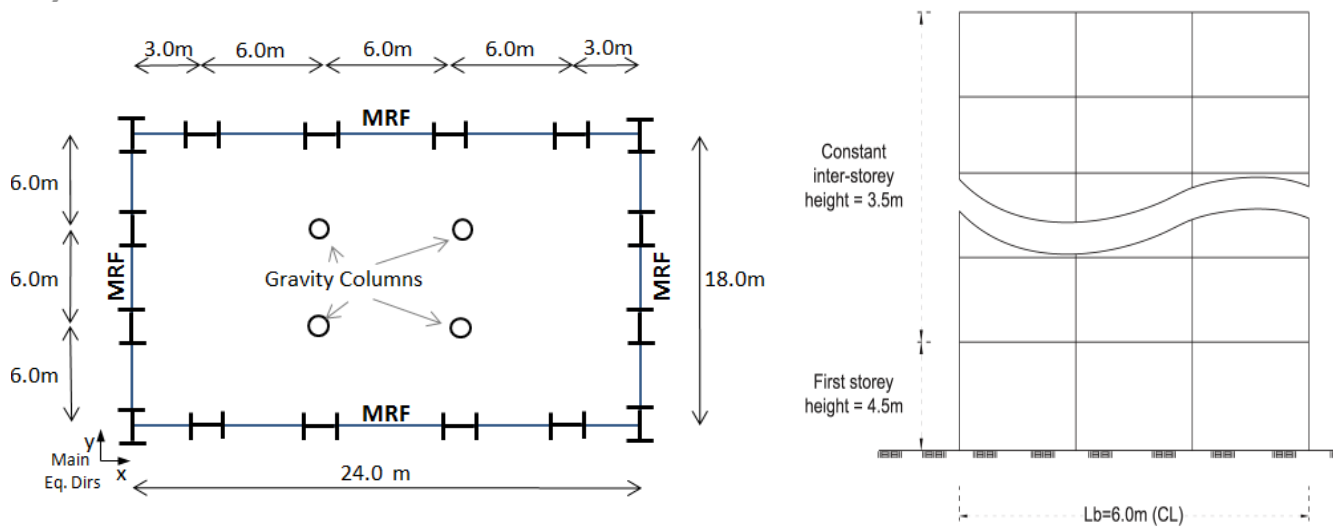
Structural layout (left) and elevation (right) for the 8-storey case study office building (drawing not to scale).
